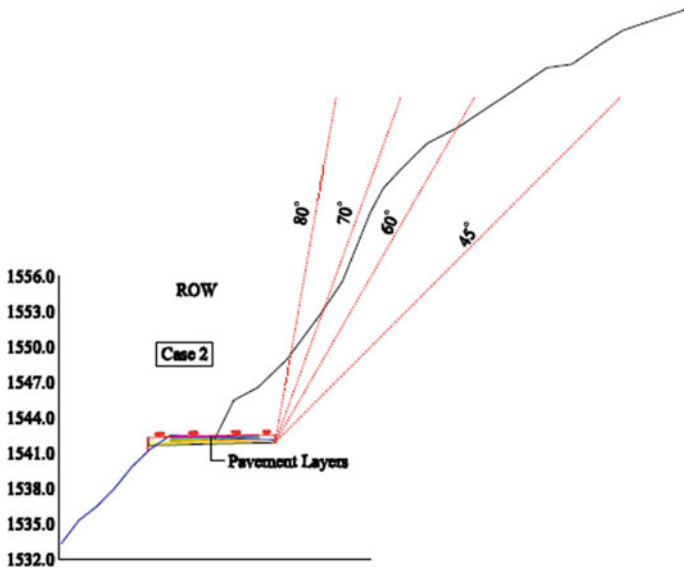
Typical cross-section of single lane road to be widened to double lane road towards uphill side
